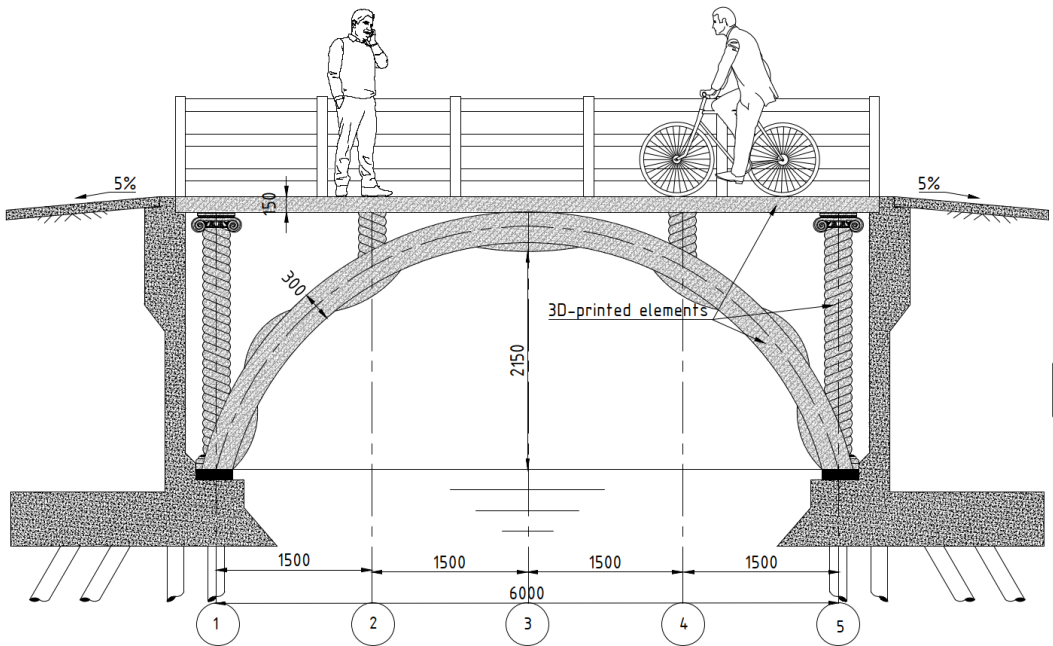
Cross section of the 3D-printed Bridge, column shape adopted from [www.royalcorinthian.com](http://www.royalcorinthian.com)
